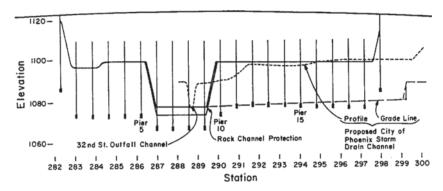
Cross section at I-10 Bridge, Phoenix, Arizona, showing channel cross-section and location of low-water channel and bridge piers and footings (from Arizona Department of Transportation 1979).
